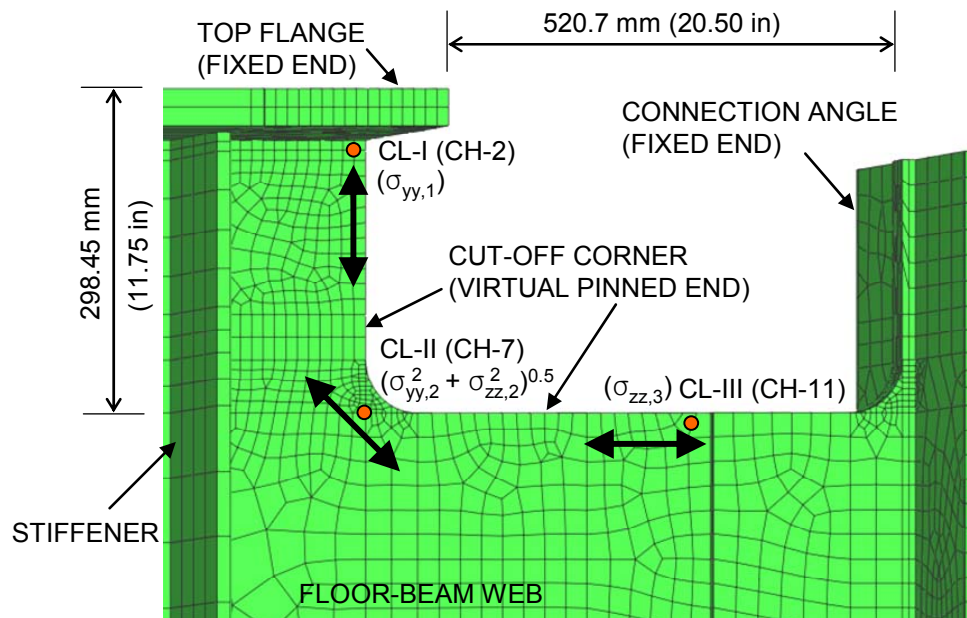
Floor-beam connection detail after retrofit with sensor locations.
